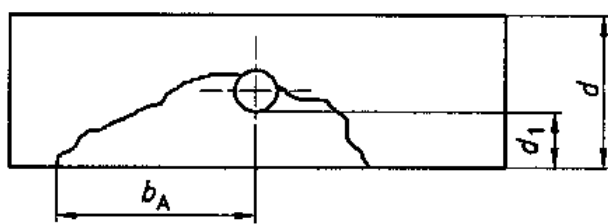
Measurements to be taken on a specimen after dowel hole failure.
